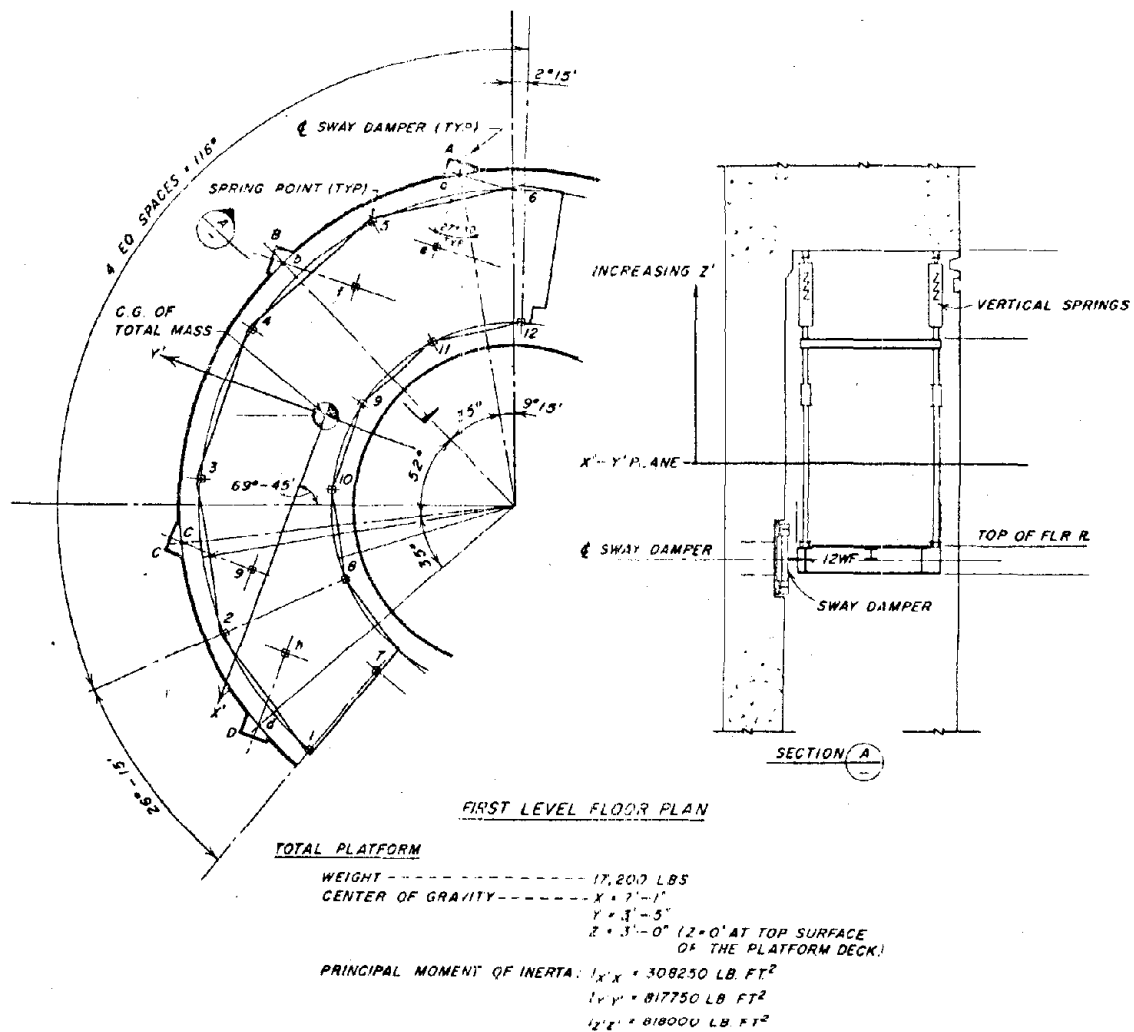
; PLAN AND SECTION VIEWS OF LER PLATFORM
